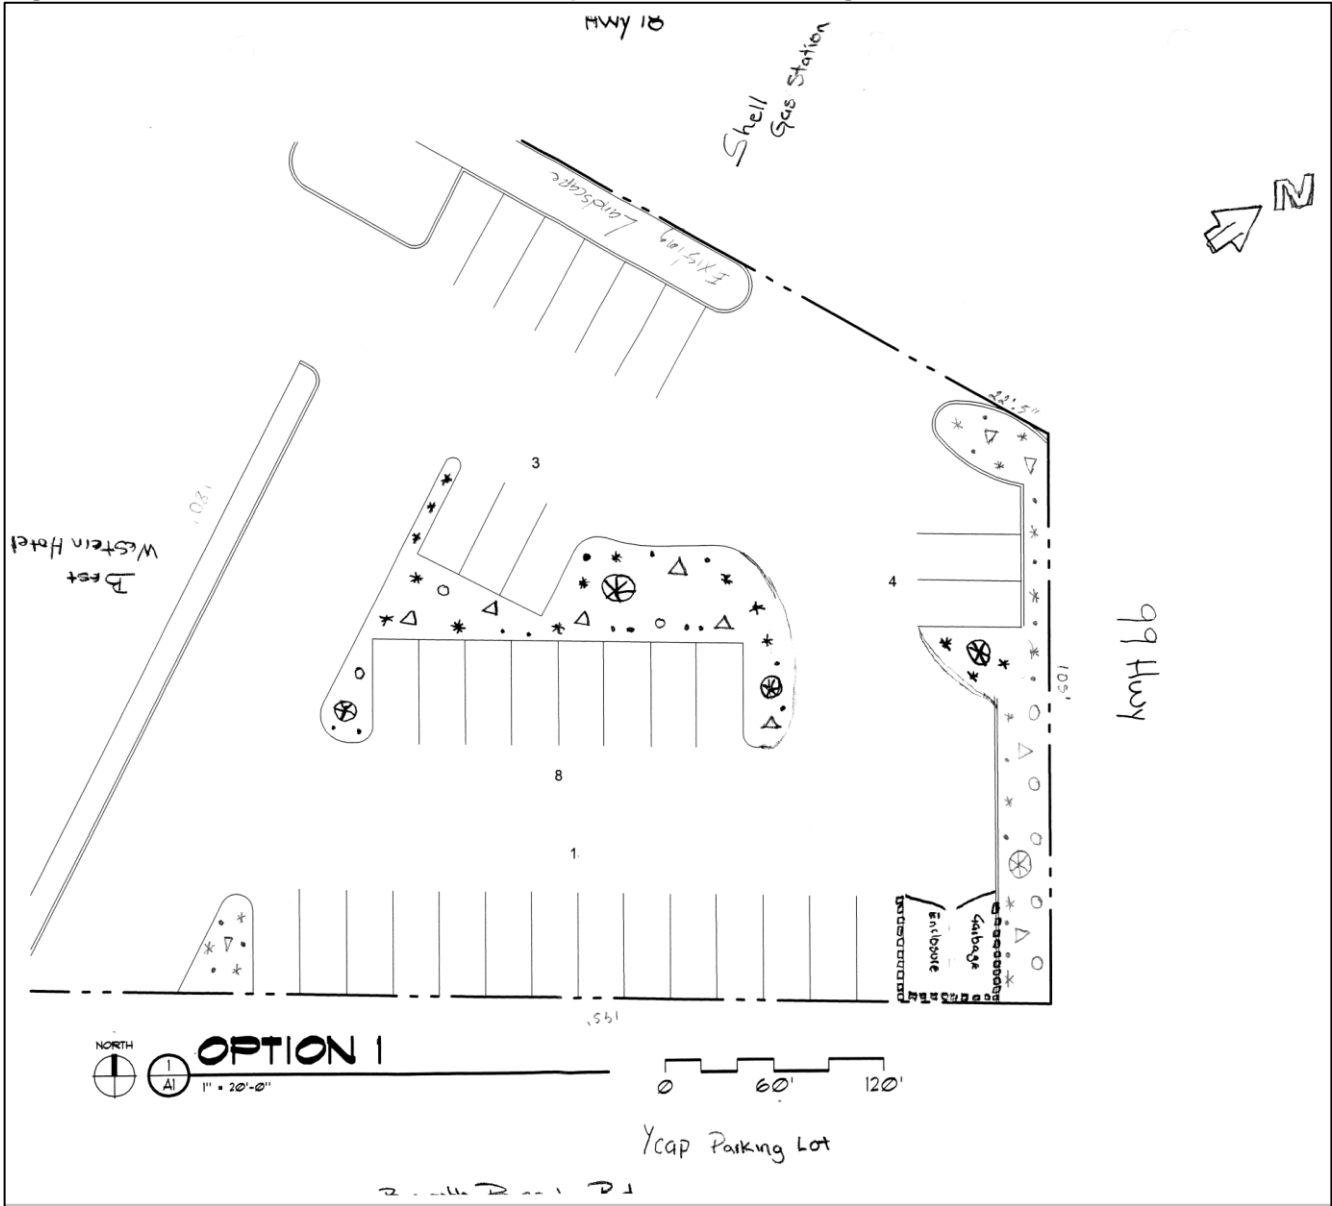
Applicant's Proposed Landscape Plan and Planting Plan
